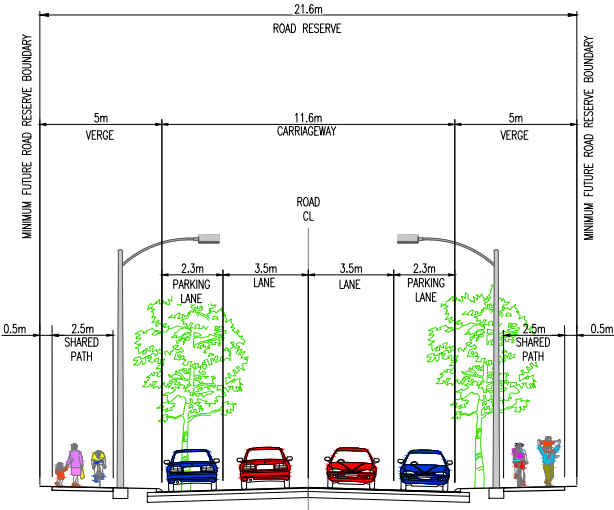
CROSS SECTION OF NEIGHBOURHOOD CONNECTOR B
